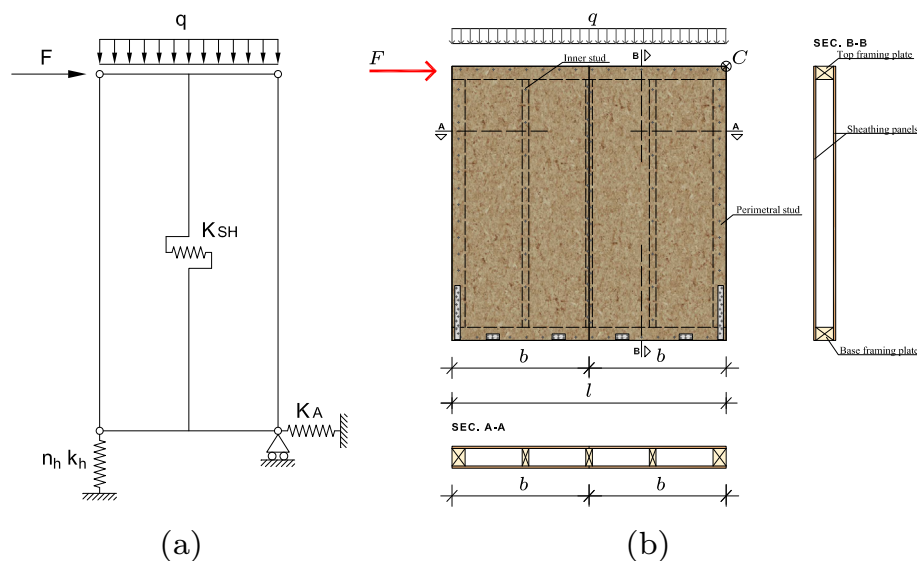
Light timber-frame wall: (a) simplified numerical model, (b) configuration.
